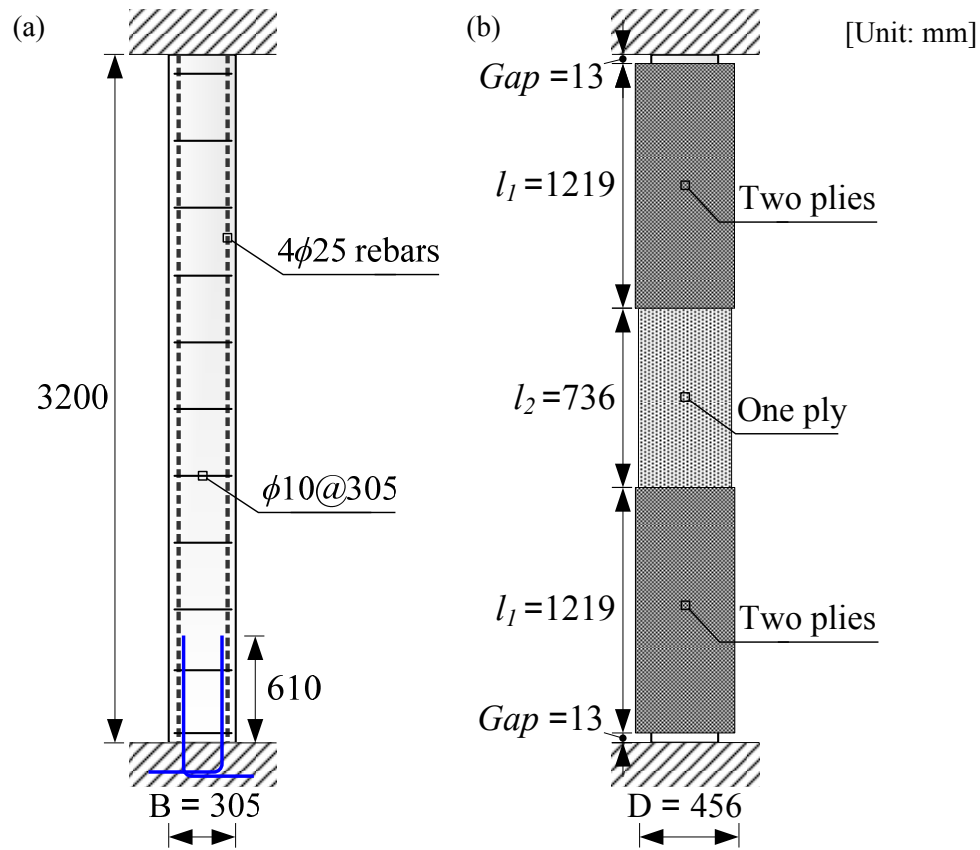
RC column details before and after installation of FRP jacketing system: (a) as-built column; (b) retrofitted column
